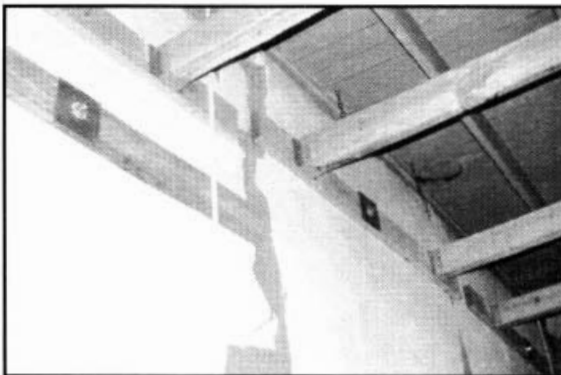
Out-of-plane offset of approximately 4 inches at a crack in the south wall of Room 9. Although this wall is buttressed by a perpendicular wall behind, the central section has pulled away from the buttressing wall behind. Figure 9.7 shows the gap between this wall and the buttressing wall behind.
